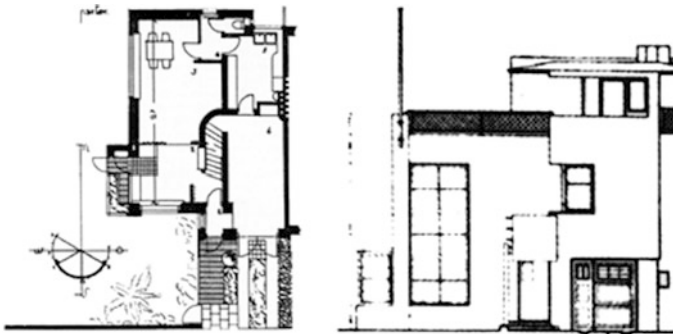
Archive drawings of plans and the elevations of the House in Niegolewskiego Street
